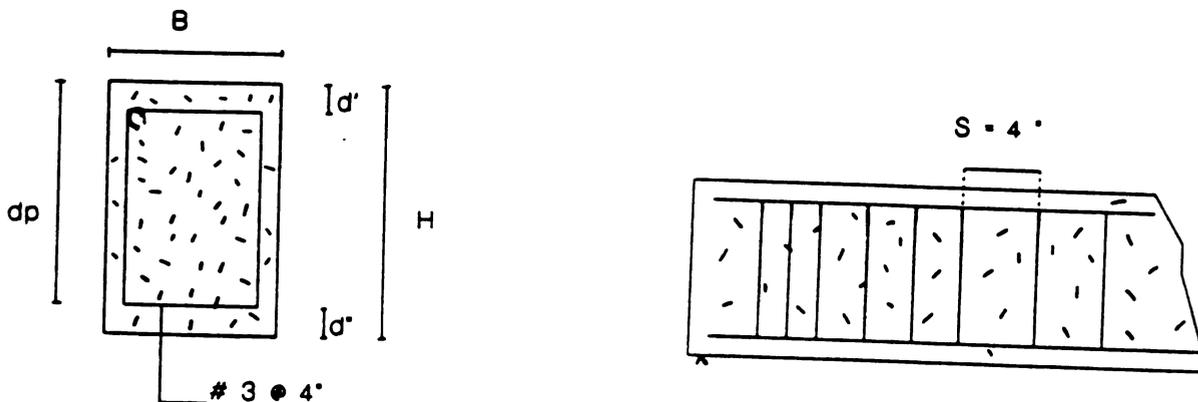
The Basic ("Standard") Reinforced Concrete Element.
